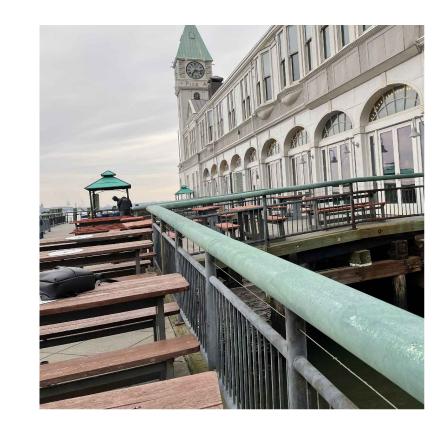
OPEN AREA #5 CORRODED HANDRAIL
